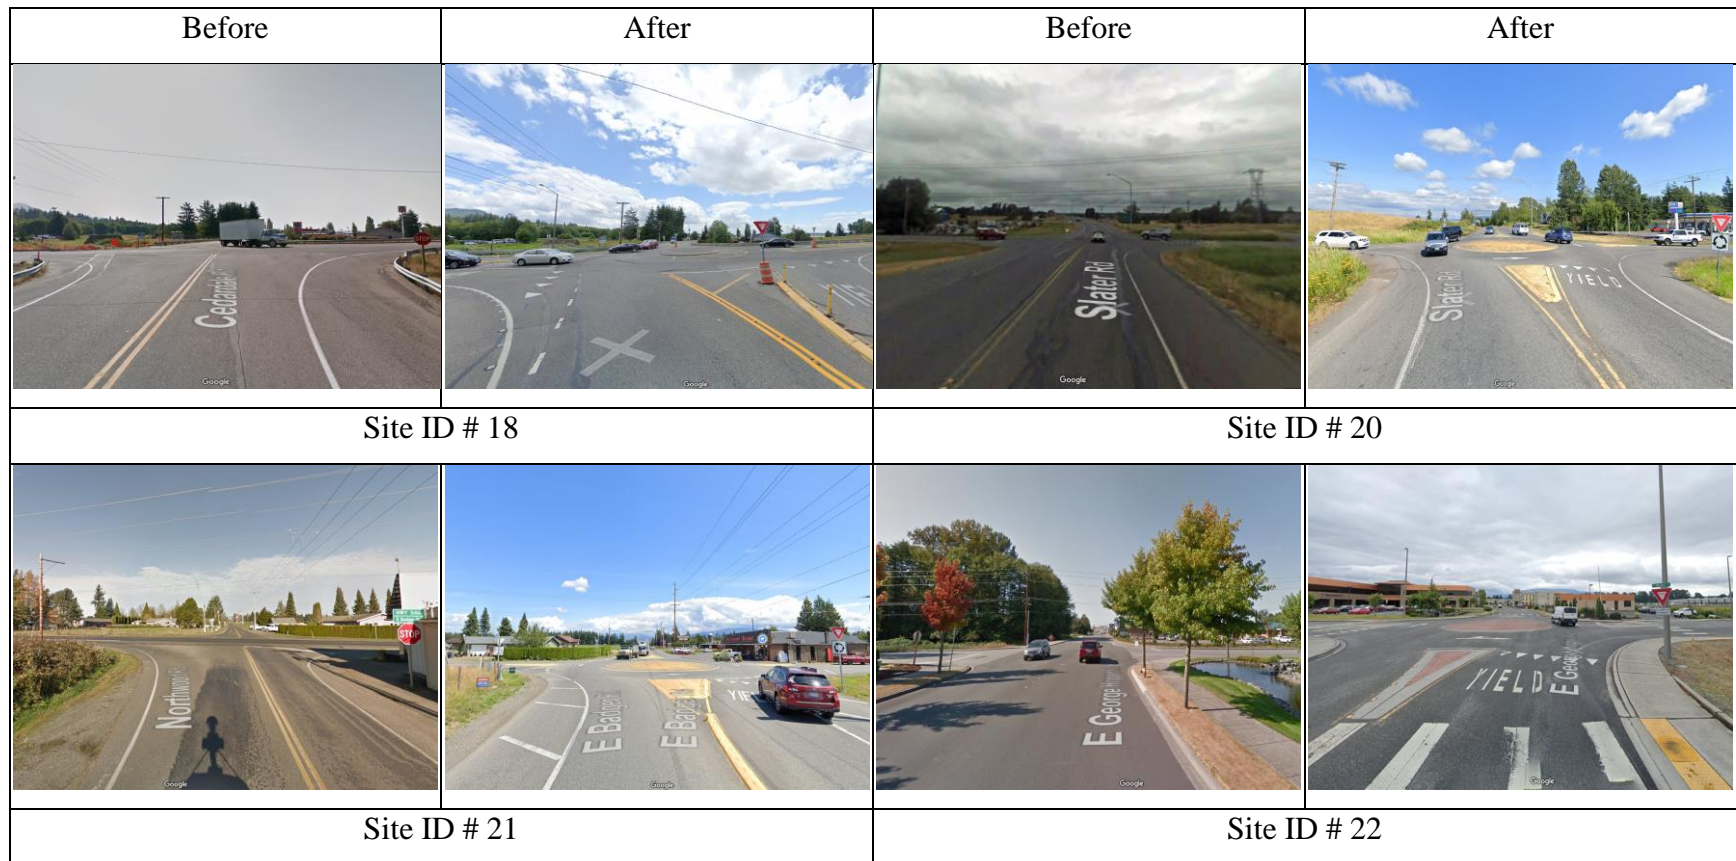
Before and after pictures of TWSC intersections converted to mini-roundabouts (© Google street view).
